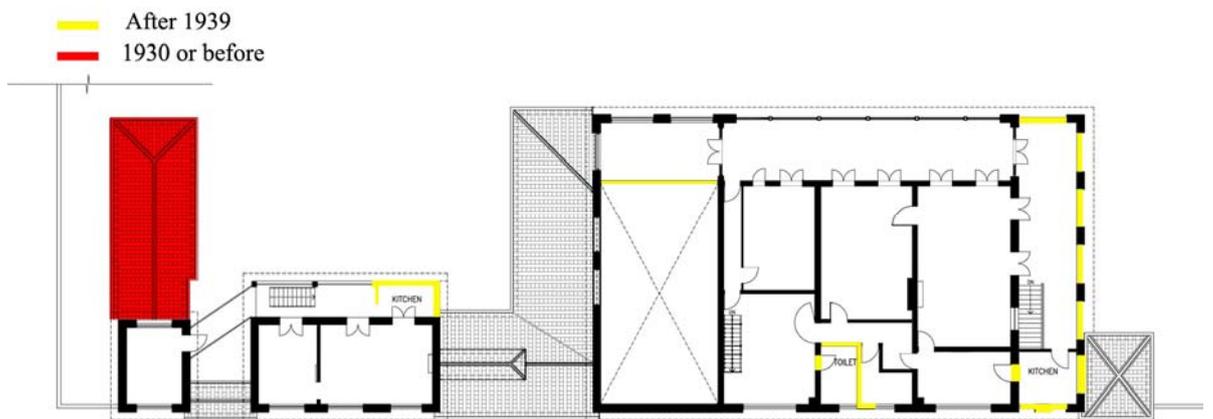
Possible first floor plan of the former clubhouse at No. 12 Oil Street before the 1969-1975 conversion.
